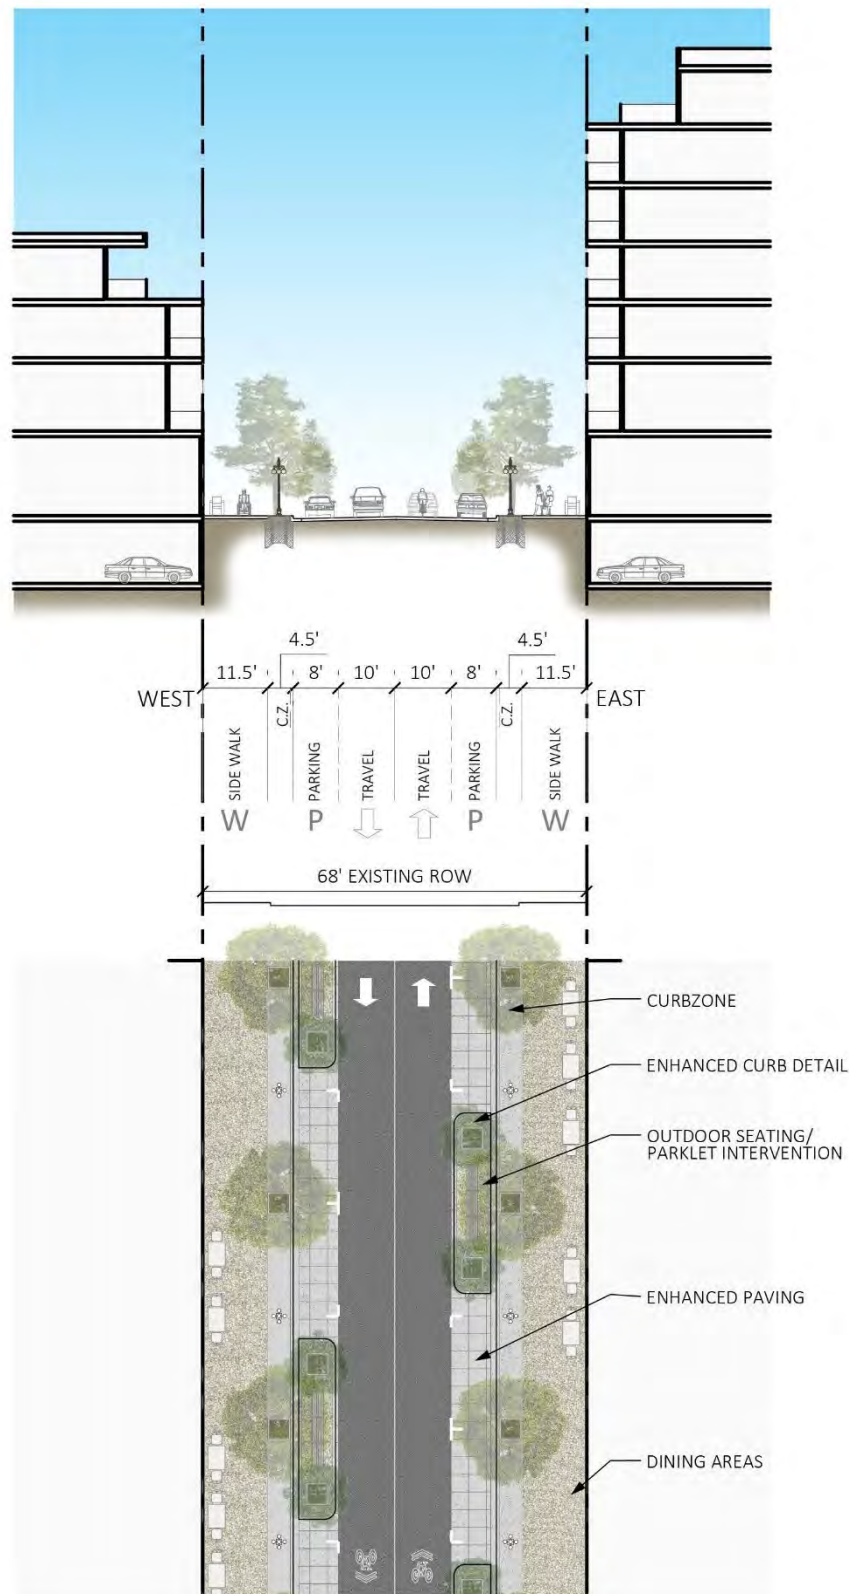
Spruce Street Between Pacific Avenue and Front Street (8)
